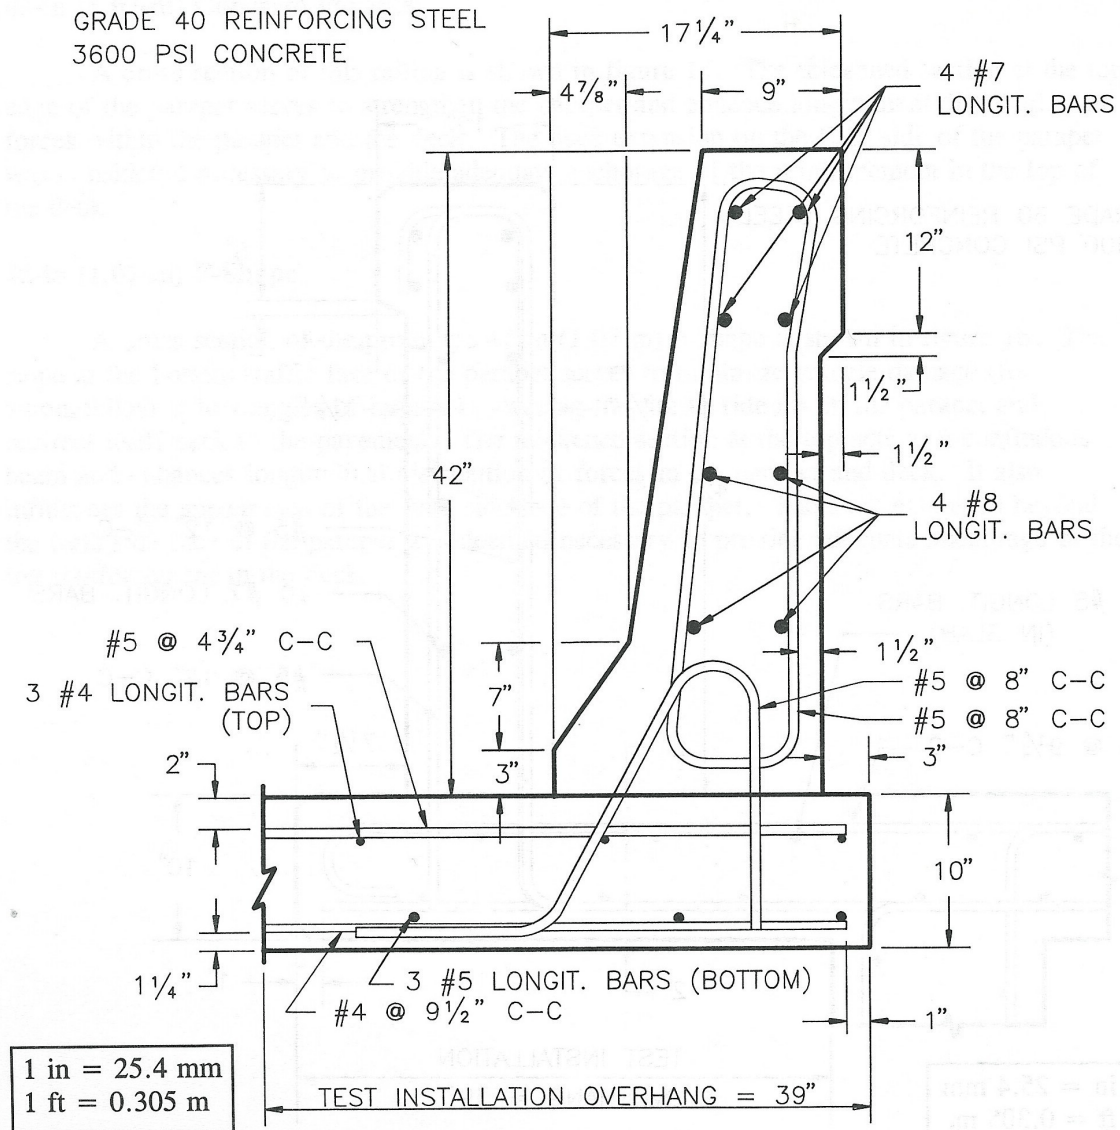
F-Shape, Half-Section Bridge Railing (PL-3 Impact Condition) [Reference No. 9]
